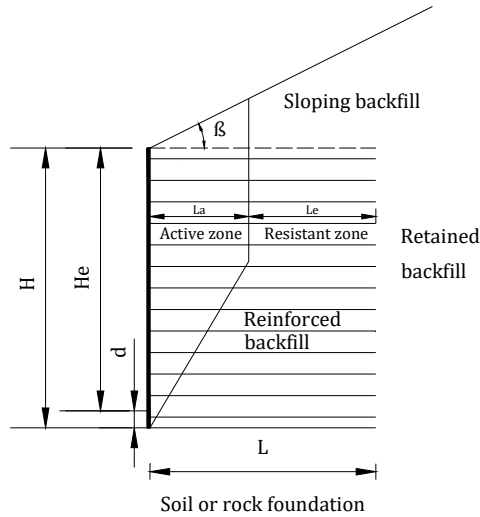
Internal stability analysis: potential failure surface for walls with inextensible reinforcements.
